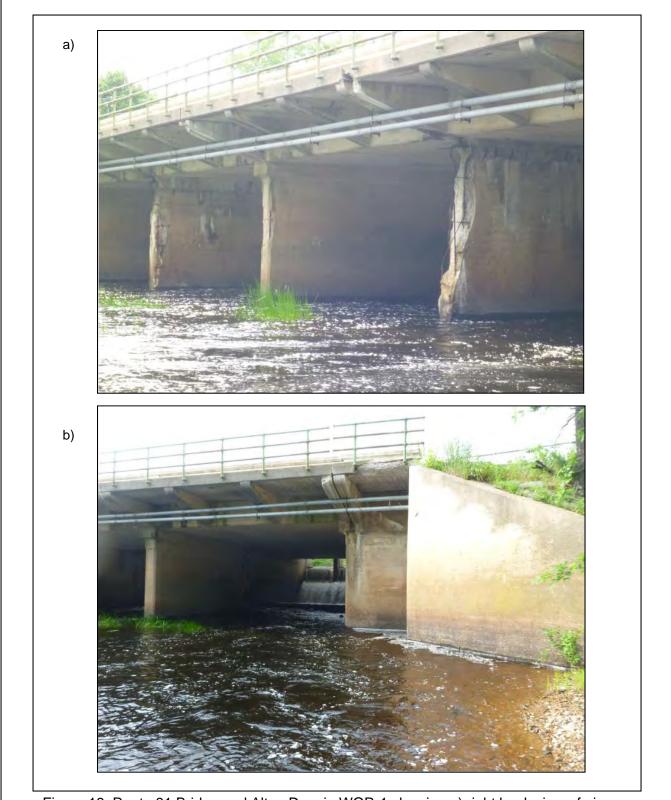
Route 91 Bridge and Alton Dam in WOR-1 showing a) right bank view of pier scour and b) dam underneath bridge.
